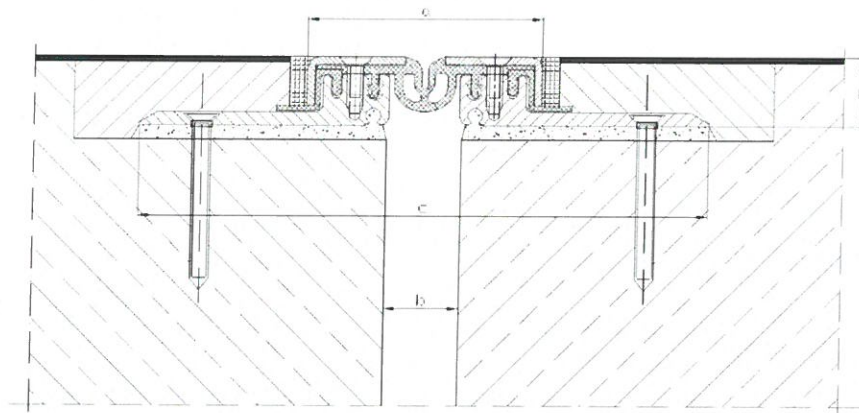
CONECTO PARK SL 230.70.CV waterproof expansion joint profile – wall mounted surface installation
